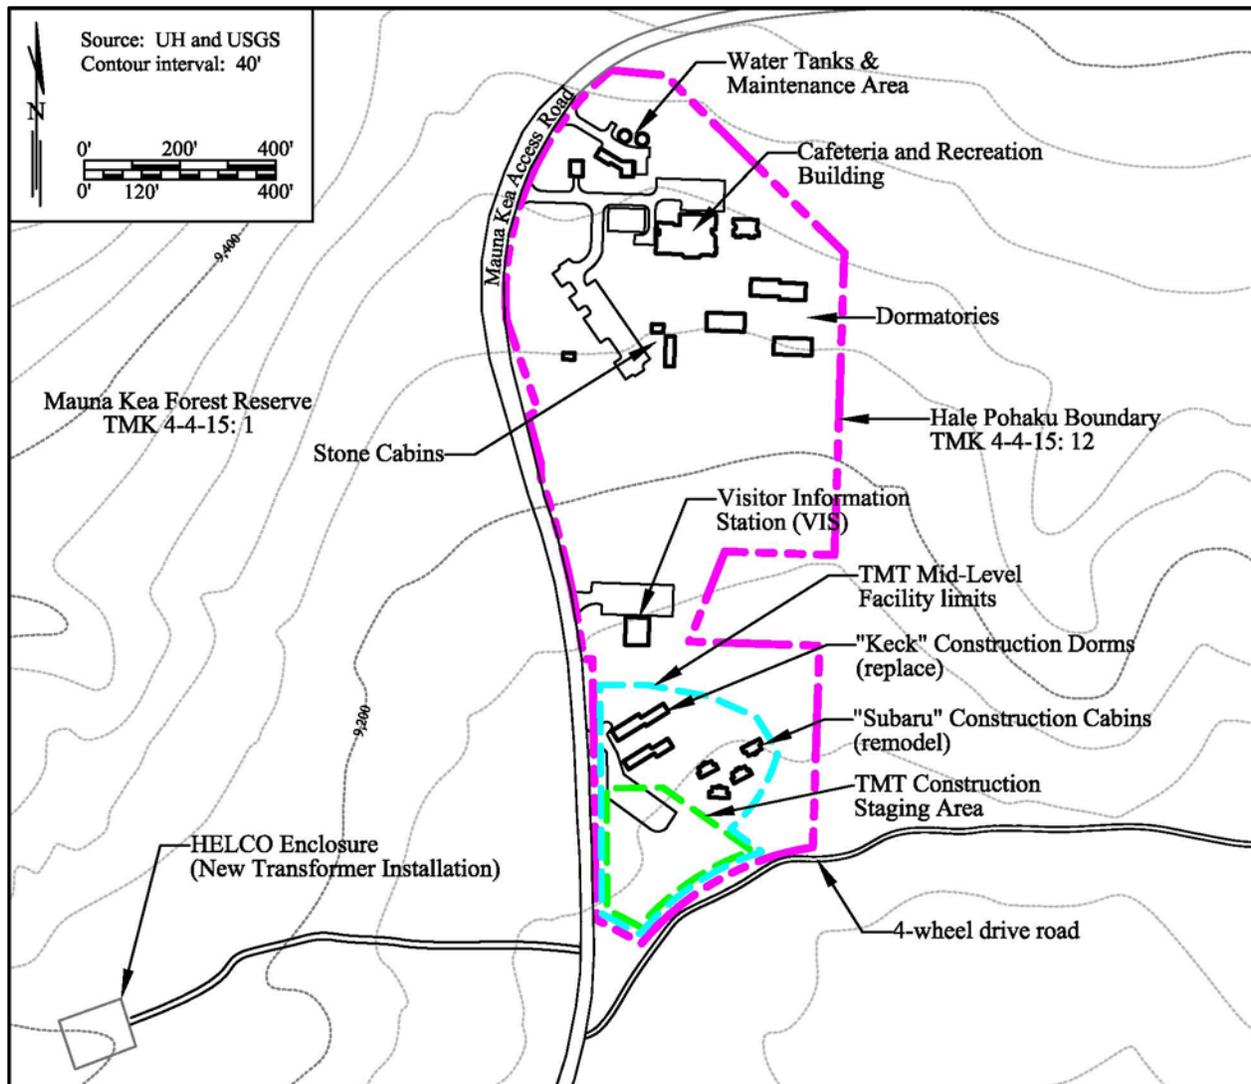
Existing and Potential Hale Pōhaku Facilities
